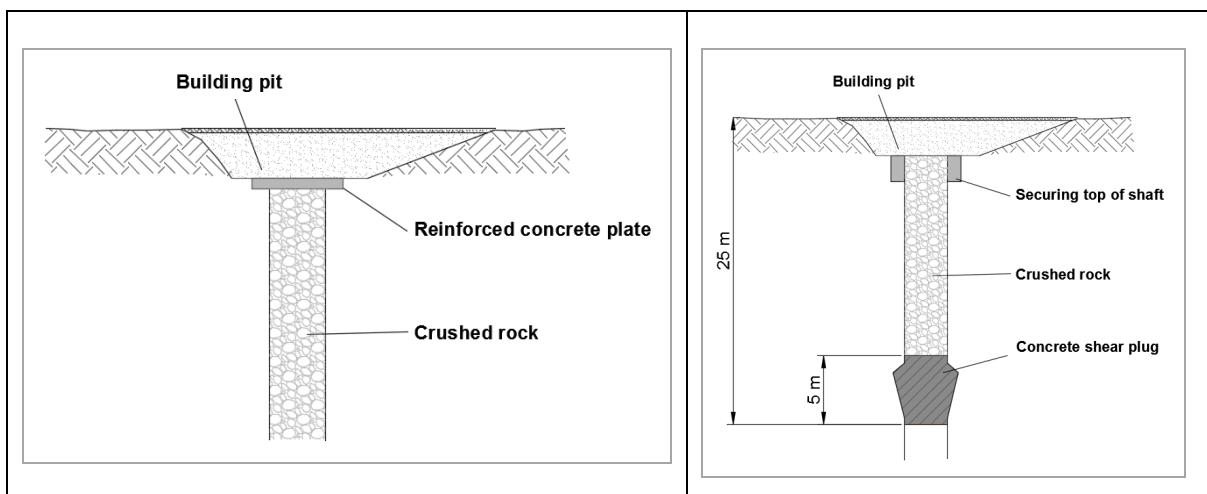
Shaft mouth sealing with reinforced concrete plate (left); shaft sealing with concrete shear plug (right)
